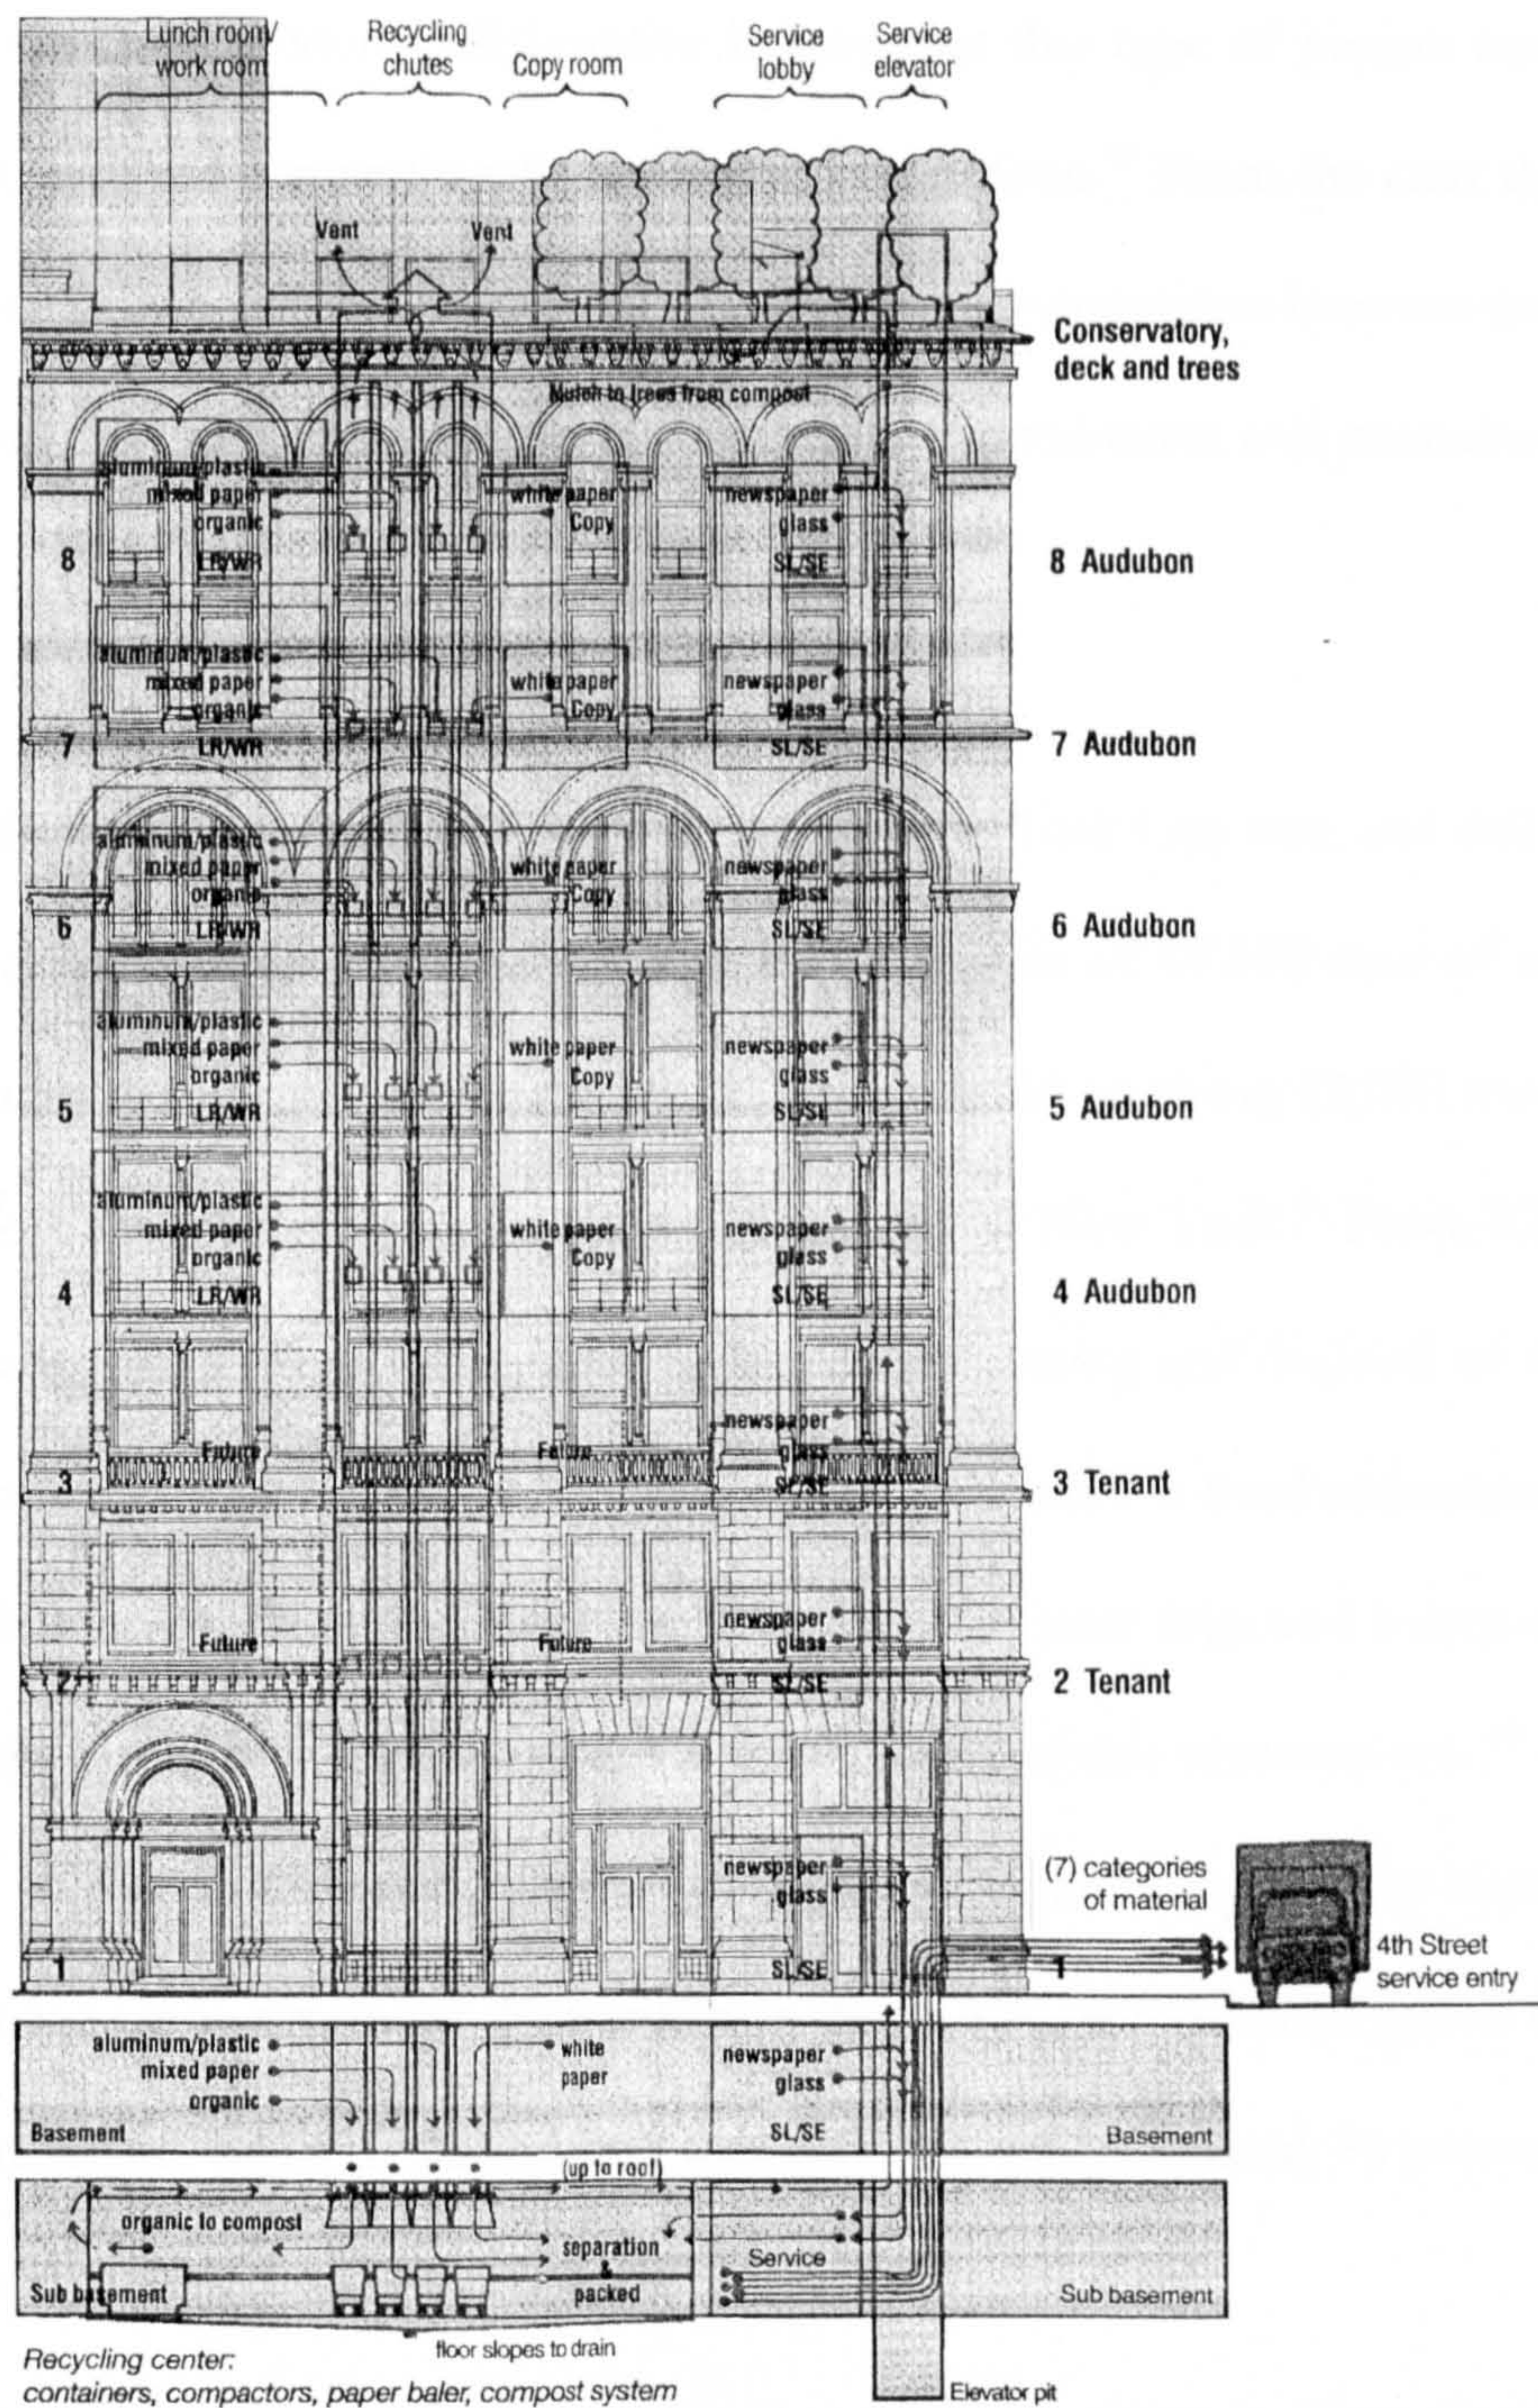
Audubon House schematic – south and west exterior elevations.ⁱ
